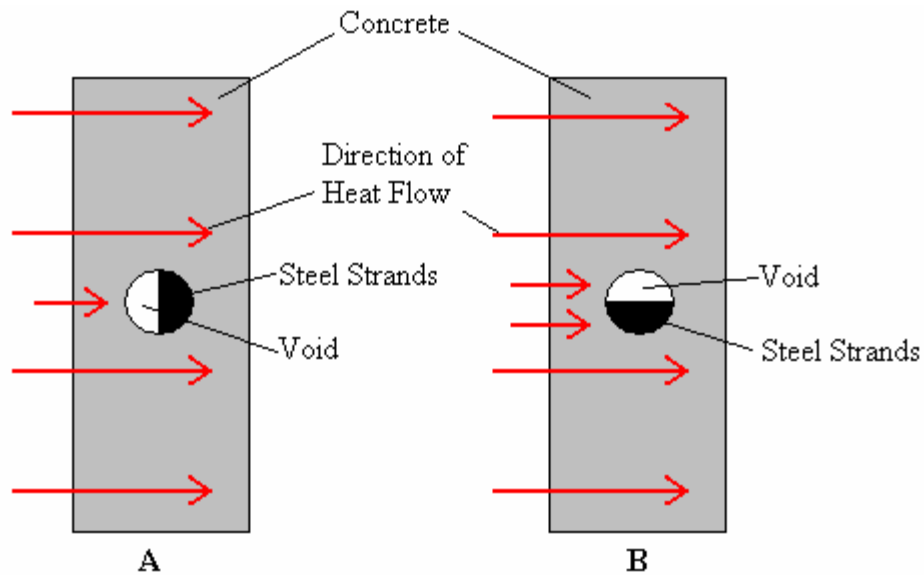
Steel strand orientation inside post-tensioning ducts for A) specimens in this study, and B) typical box girder bridge wall (Pearson, 2003)
